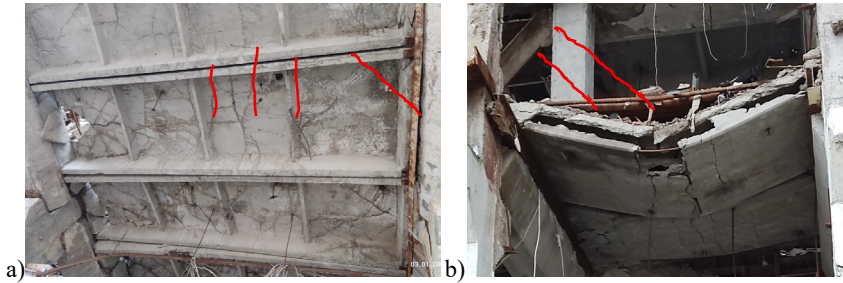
Damage to columns of a multi-storey frame building:
